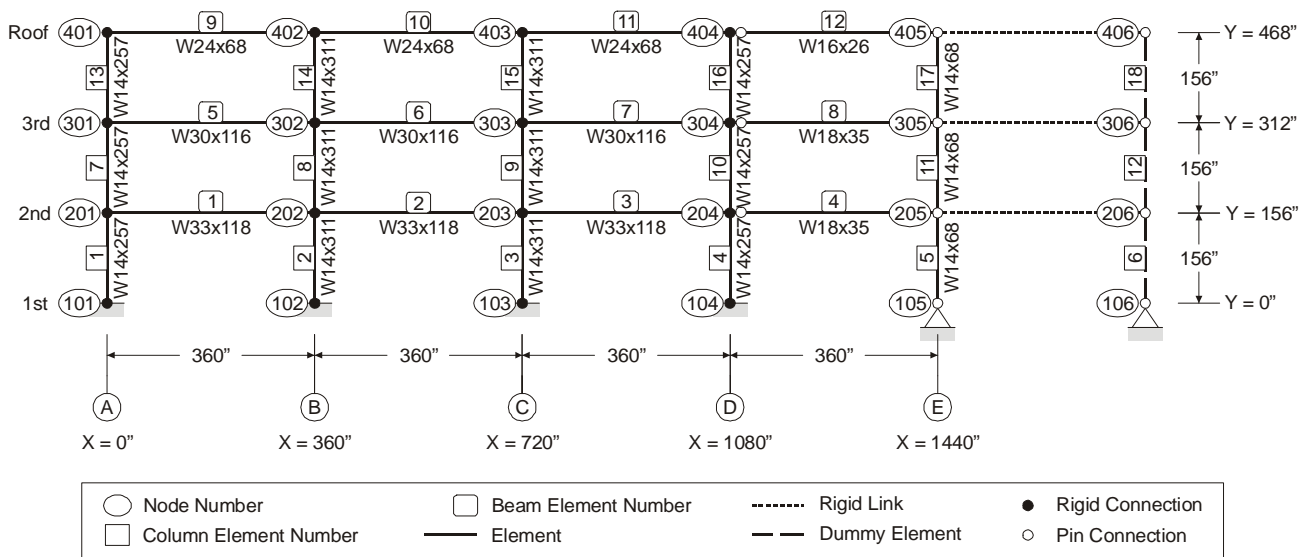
Drain model of the 3-story (regular and weak story) steel frames.
